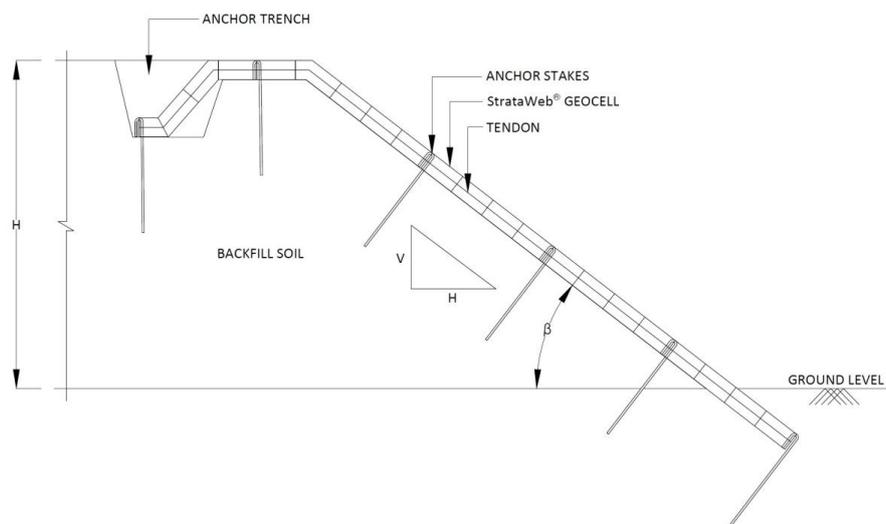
Typical cross section of embankment slope with geocell for slope erosion protection
